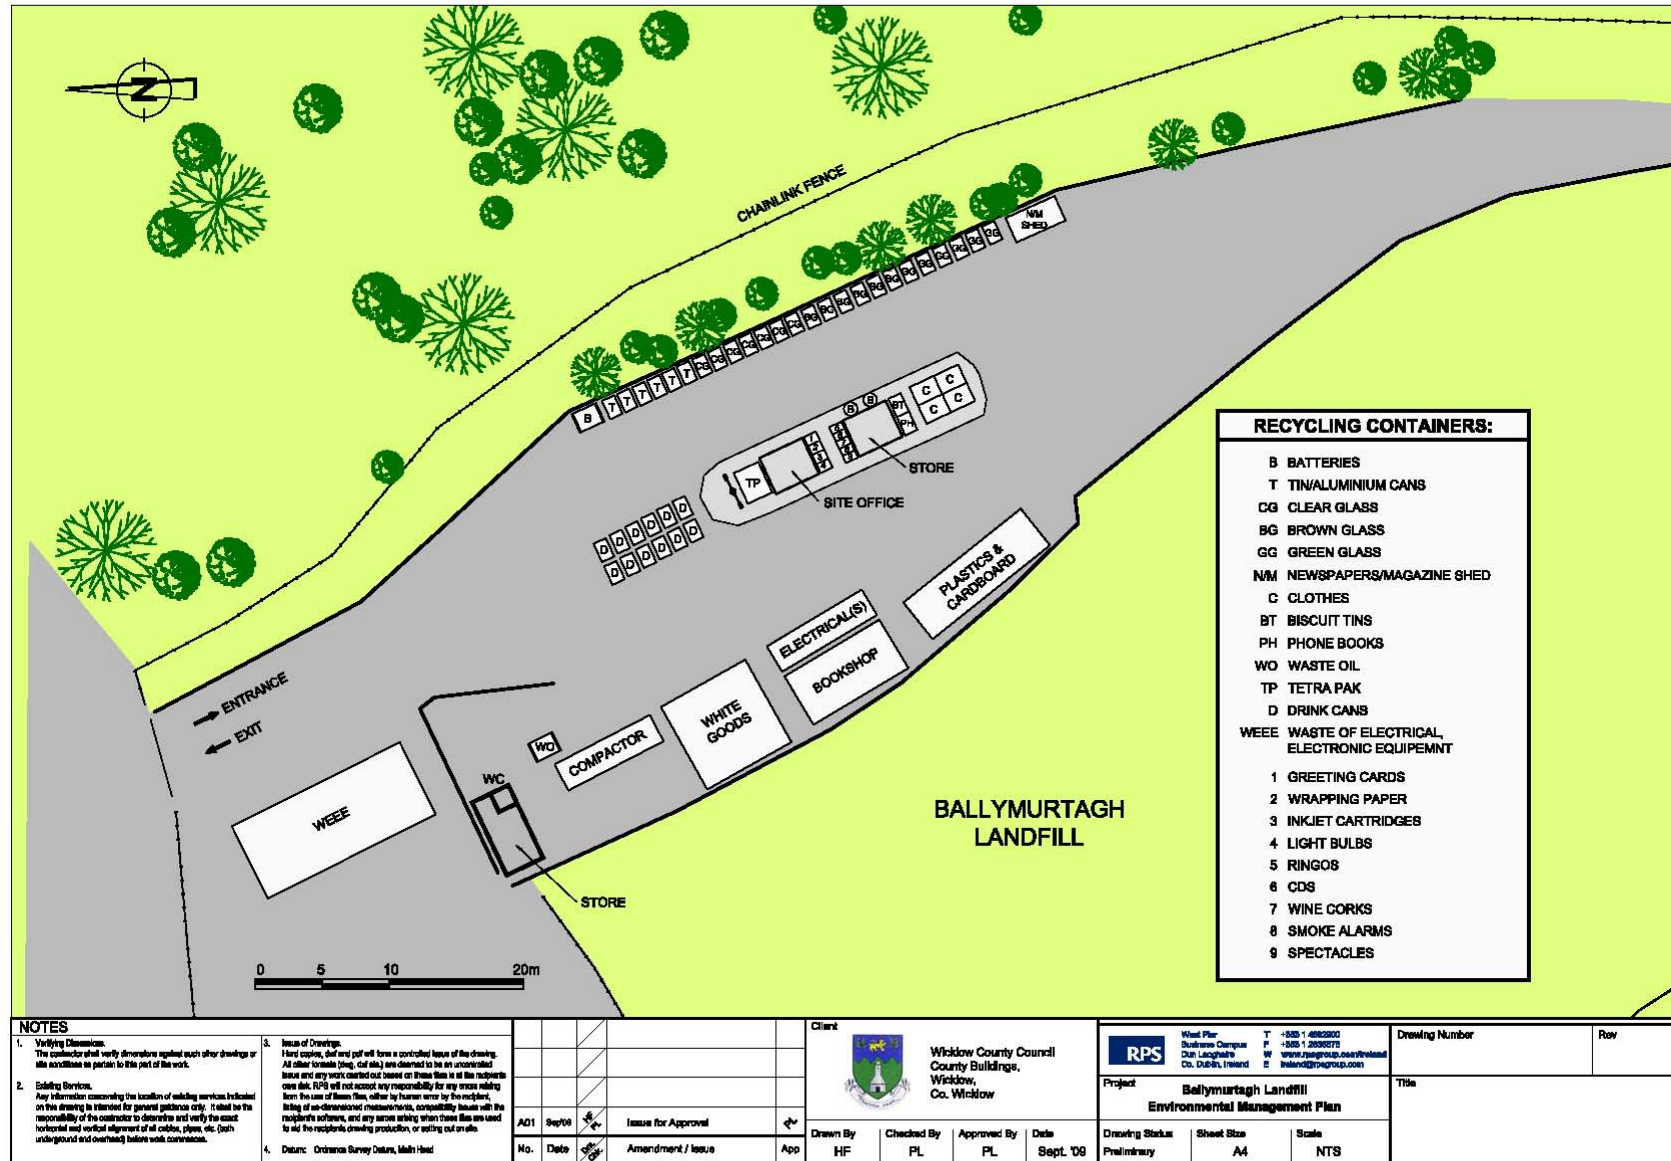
Layout of Civic Waste Facility (RPS, 2008)
